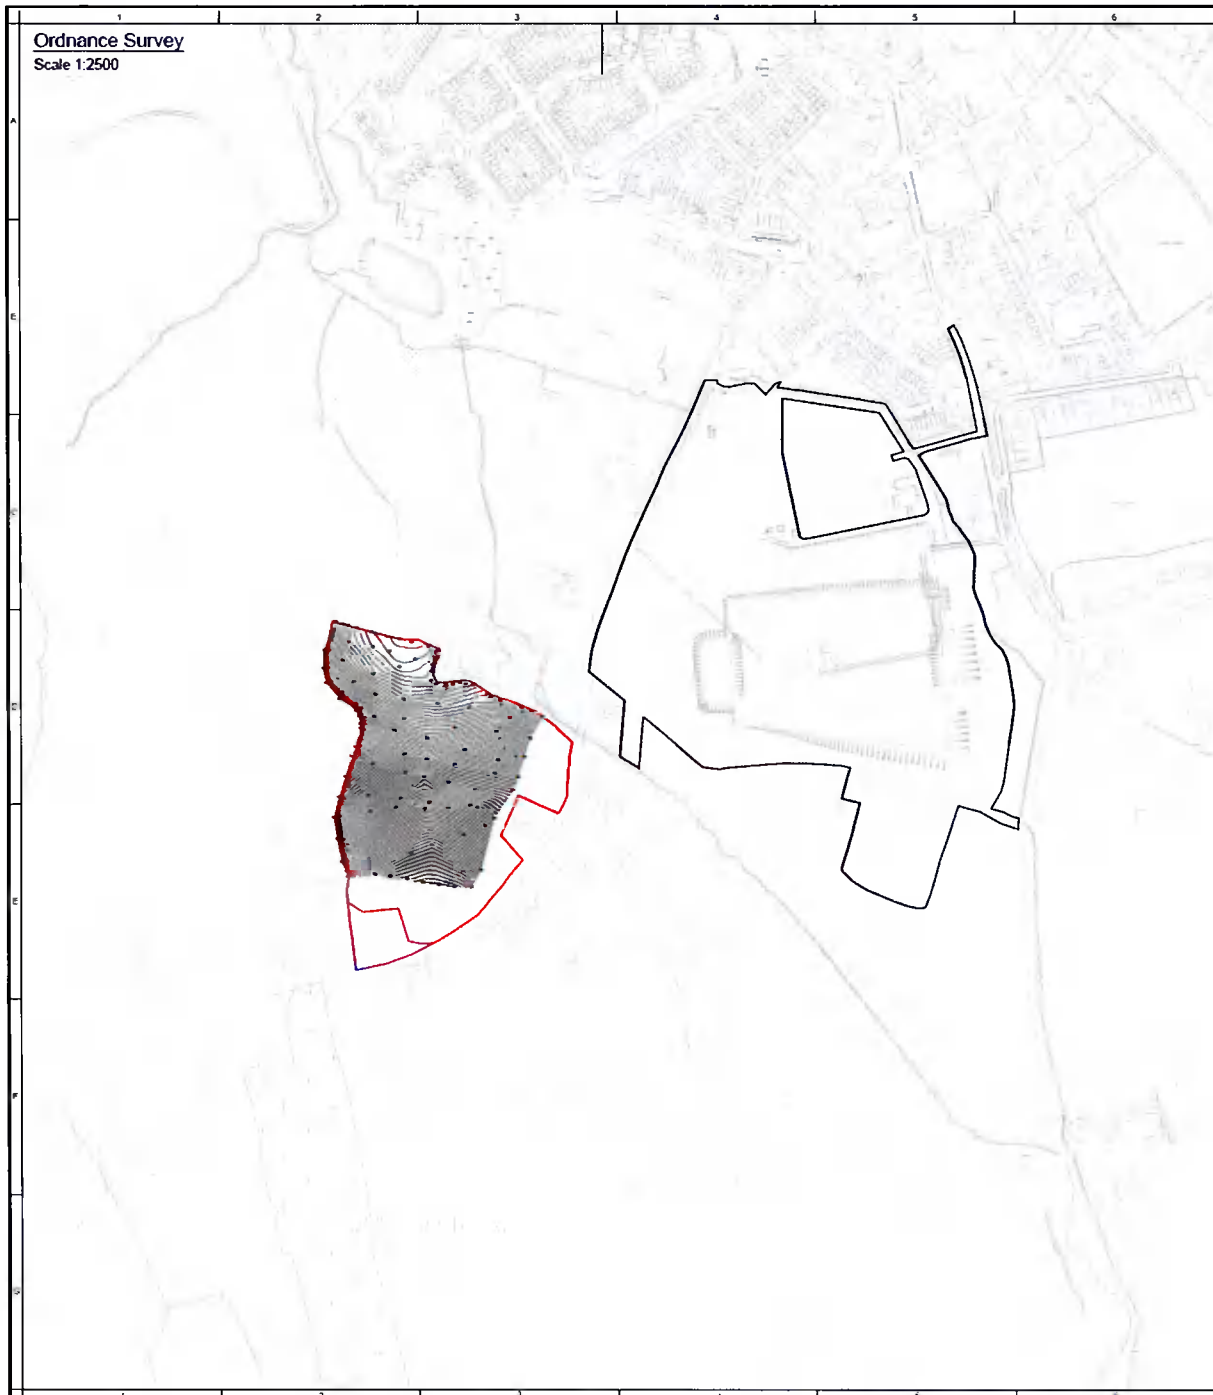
Site Location Plan and Site Plan with Proposed Development Boundary
